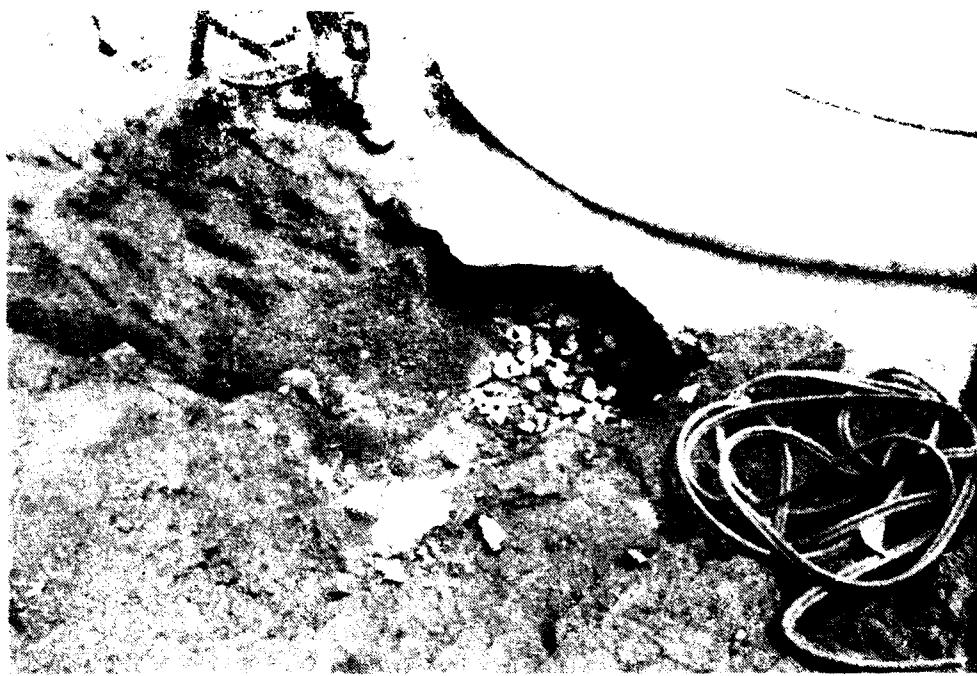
"Bathtub" treatment - placing concrete by hand.
